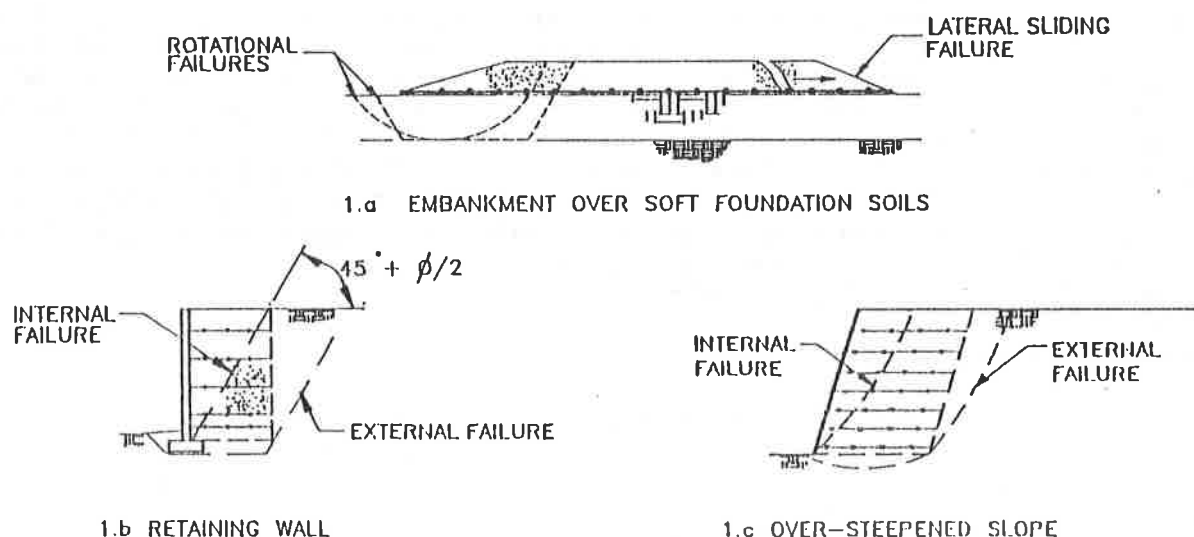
REINFORCED SLOPES & FAILURE PLANES
